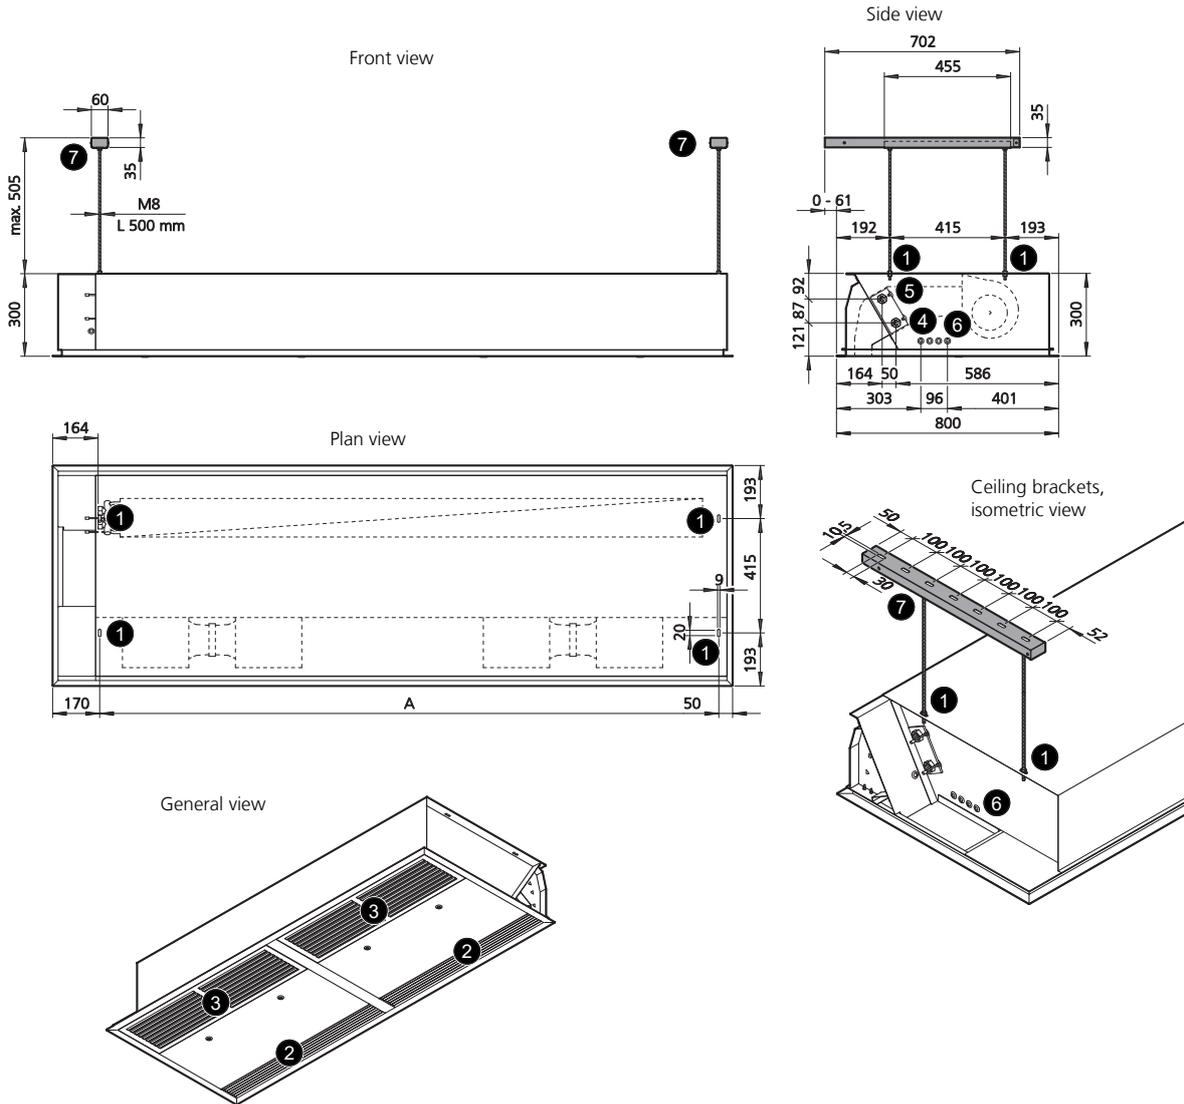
Suspension points for Tandem 300 ceiling cassette model 12 - 30 with ceiling brackets
